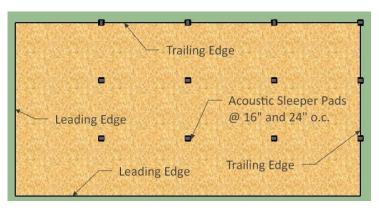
Typical Inverted Plan for lower panel on concrete and other decks
